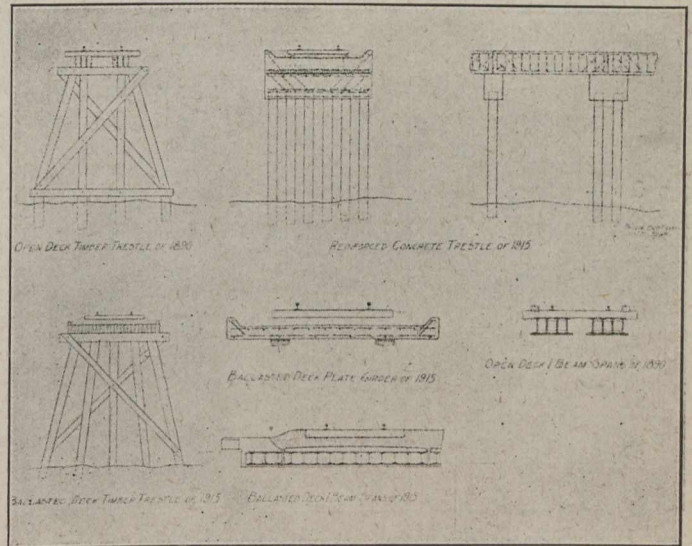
Trestle and I-Beam Bridges of 1890-1915.
